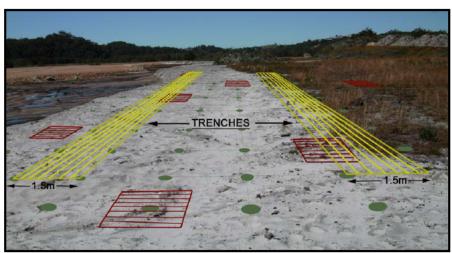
Sand Ridge Excavation: Example of Stage 4 Trenching
